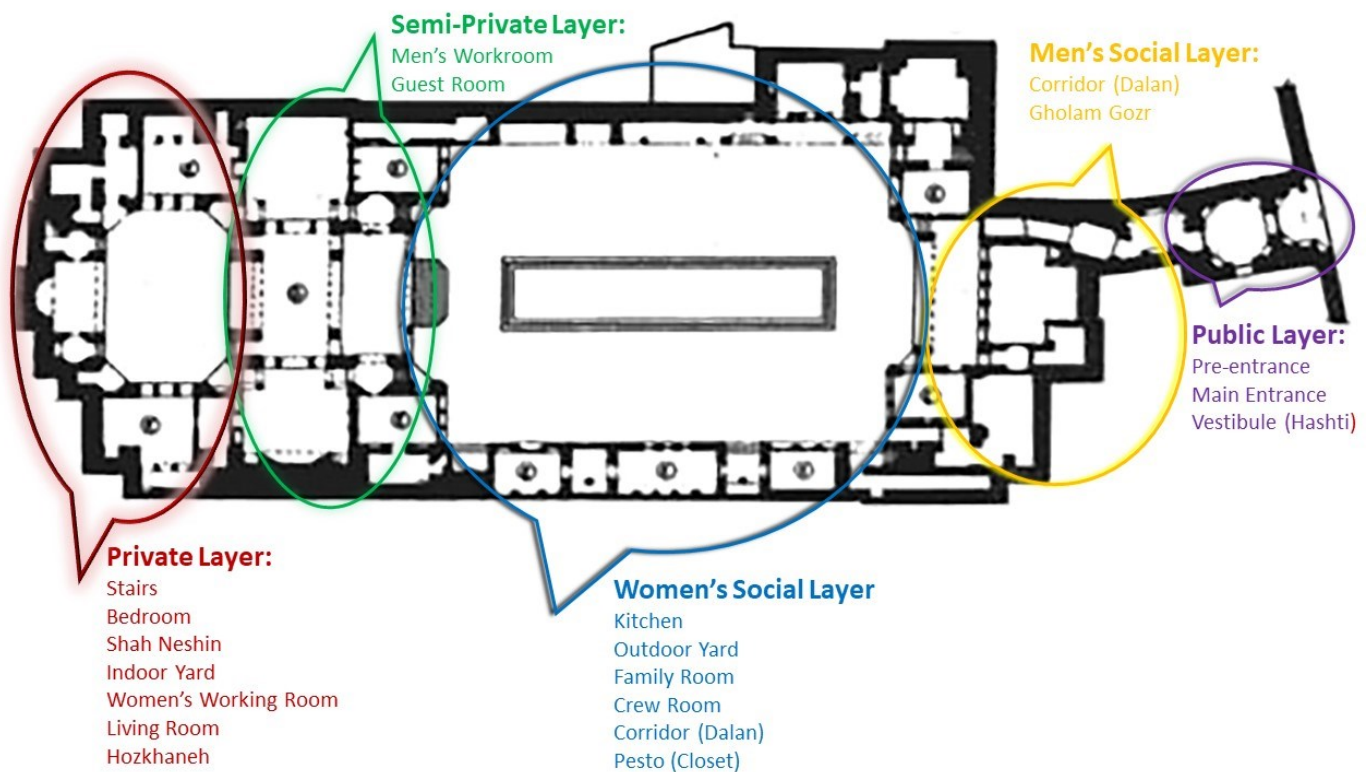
Analyzing the houses' ground floor layers according to privacy. Borujerdi House, Kashan, Iran. (Source: Authors)
